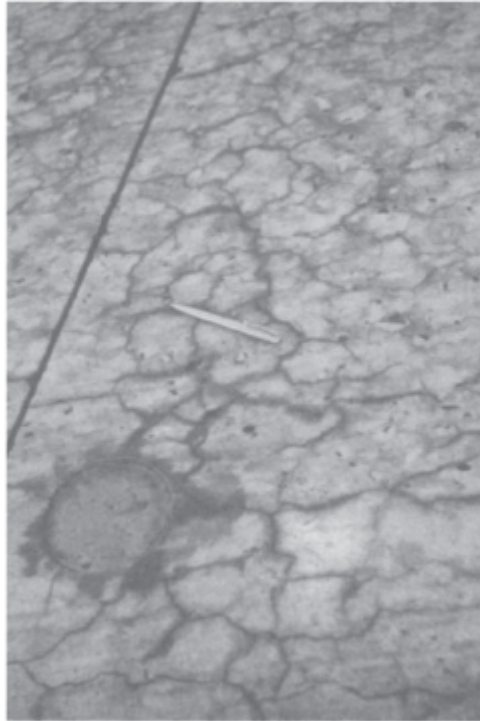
Map Cracking, Portion of Concrete Road Pavement (Swamy 1992).
